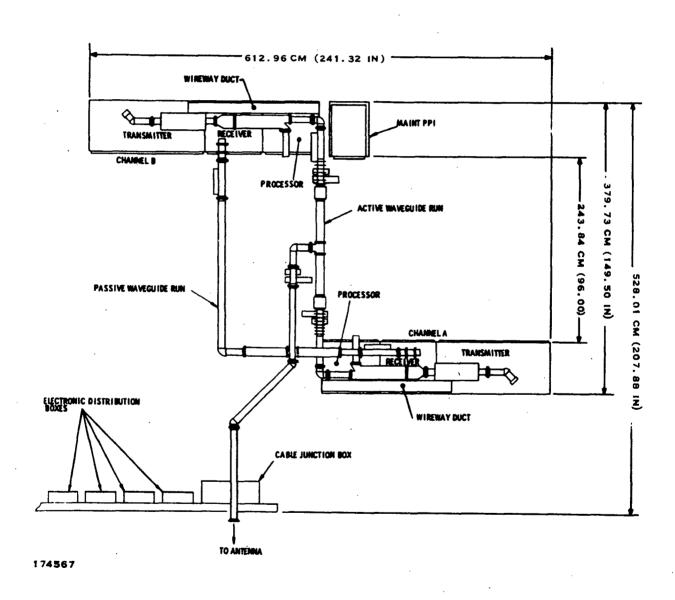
Fixed-Site Equipment Layout (Typical)
